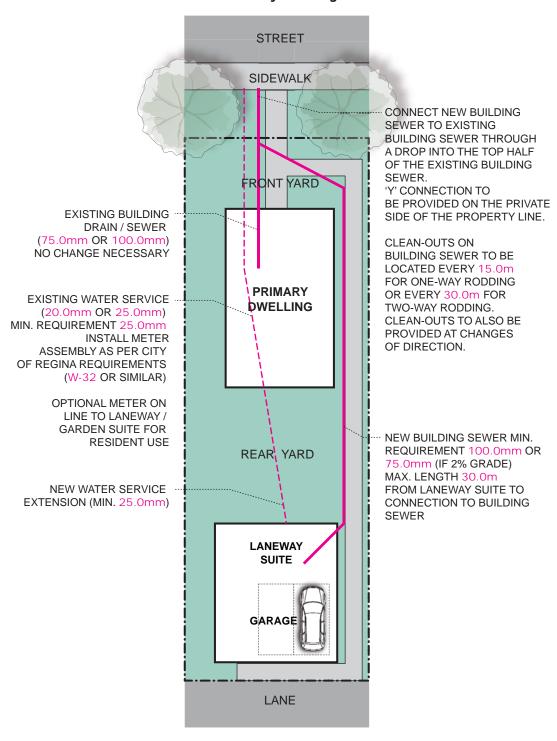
LANEWAY AND GARDEN SUITES - UTILITIES AND SERVICING OPTION 1
